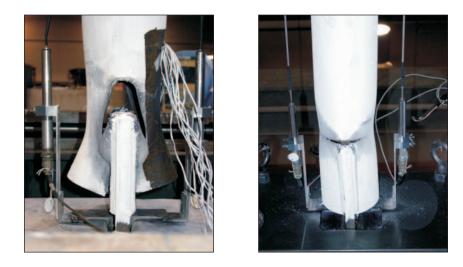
Typical slotted HSS-to-gusset connection failures: tear-out failure (left); net-section fracture (right) [images courtesy of the University of Toronto]
